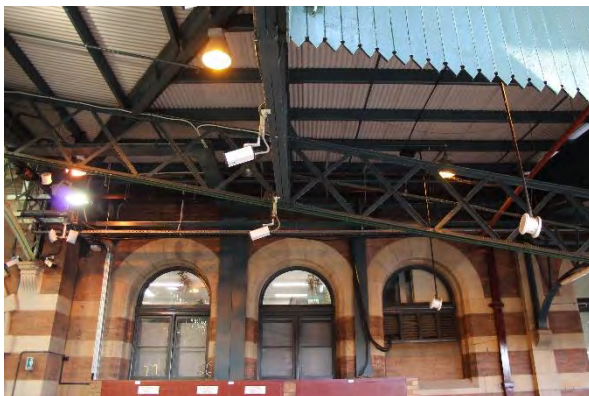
WEST FAÇADE OF MAIN TERMINUS EAST WING, SHOWING EXISTING SERVICES AND STRUCTURES OBSCURING VIEWS TO THIS FAÇADE.
